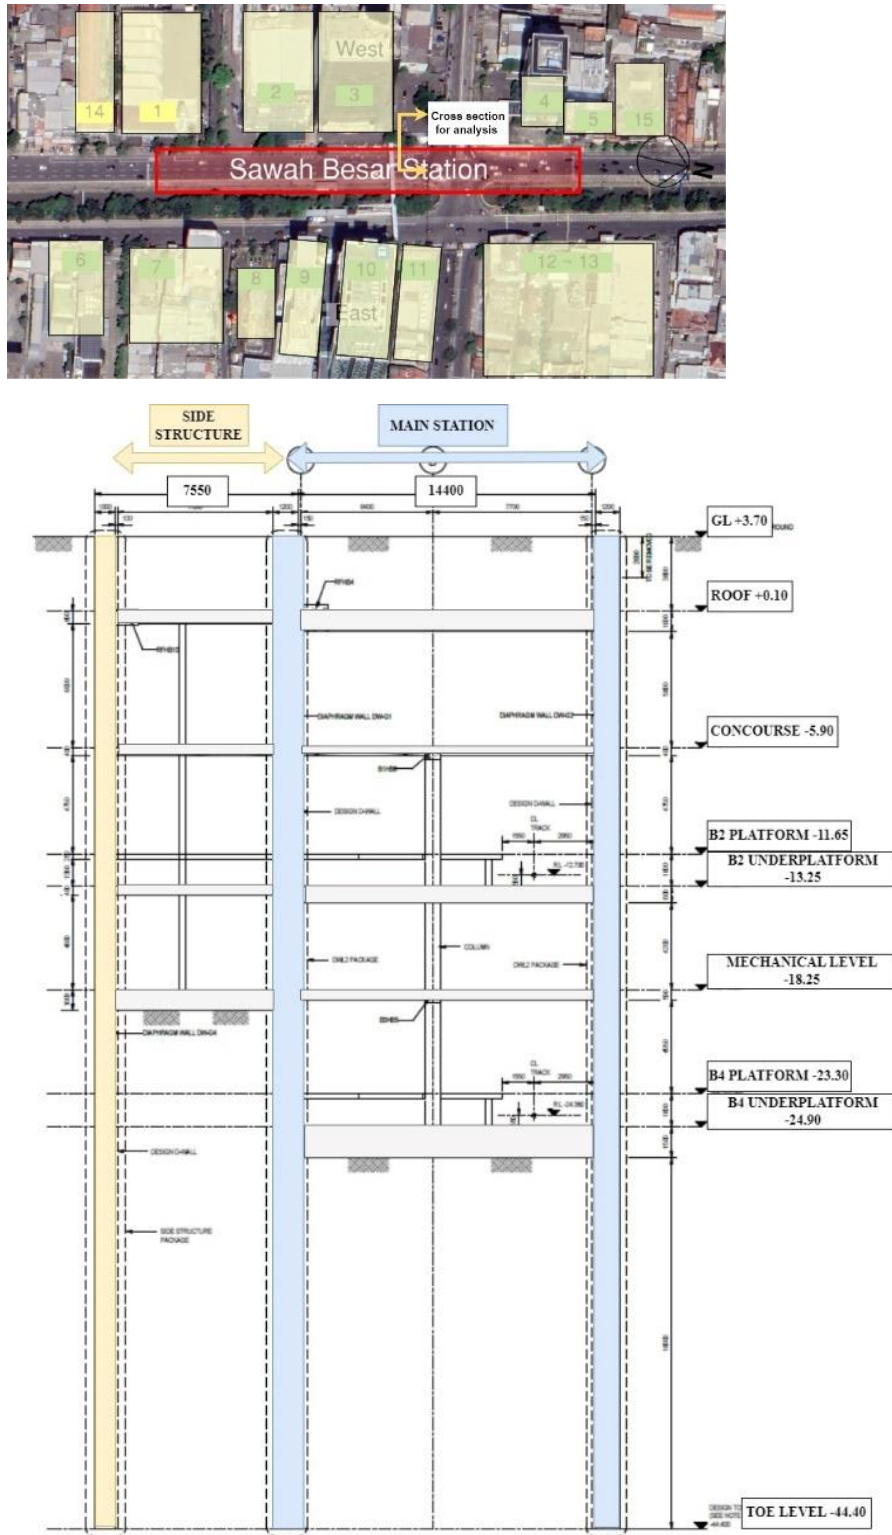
Plan view and cross section of Sawah Besar Station permanent structures
